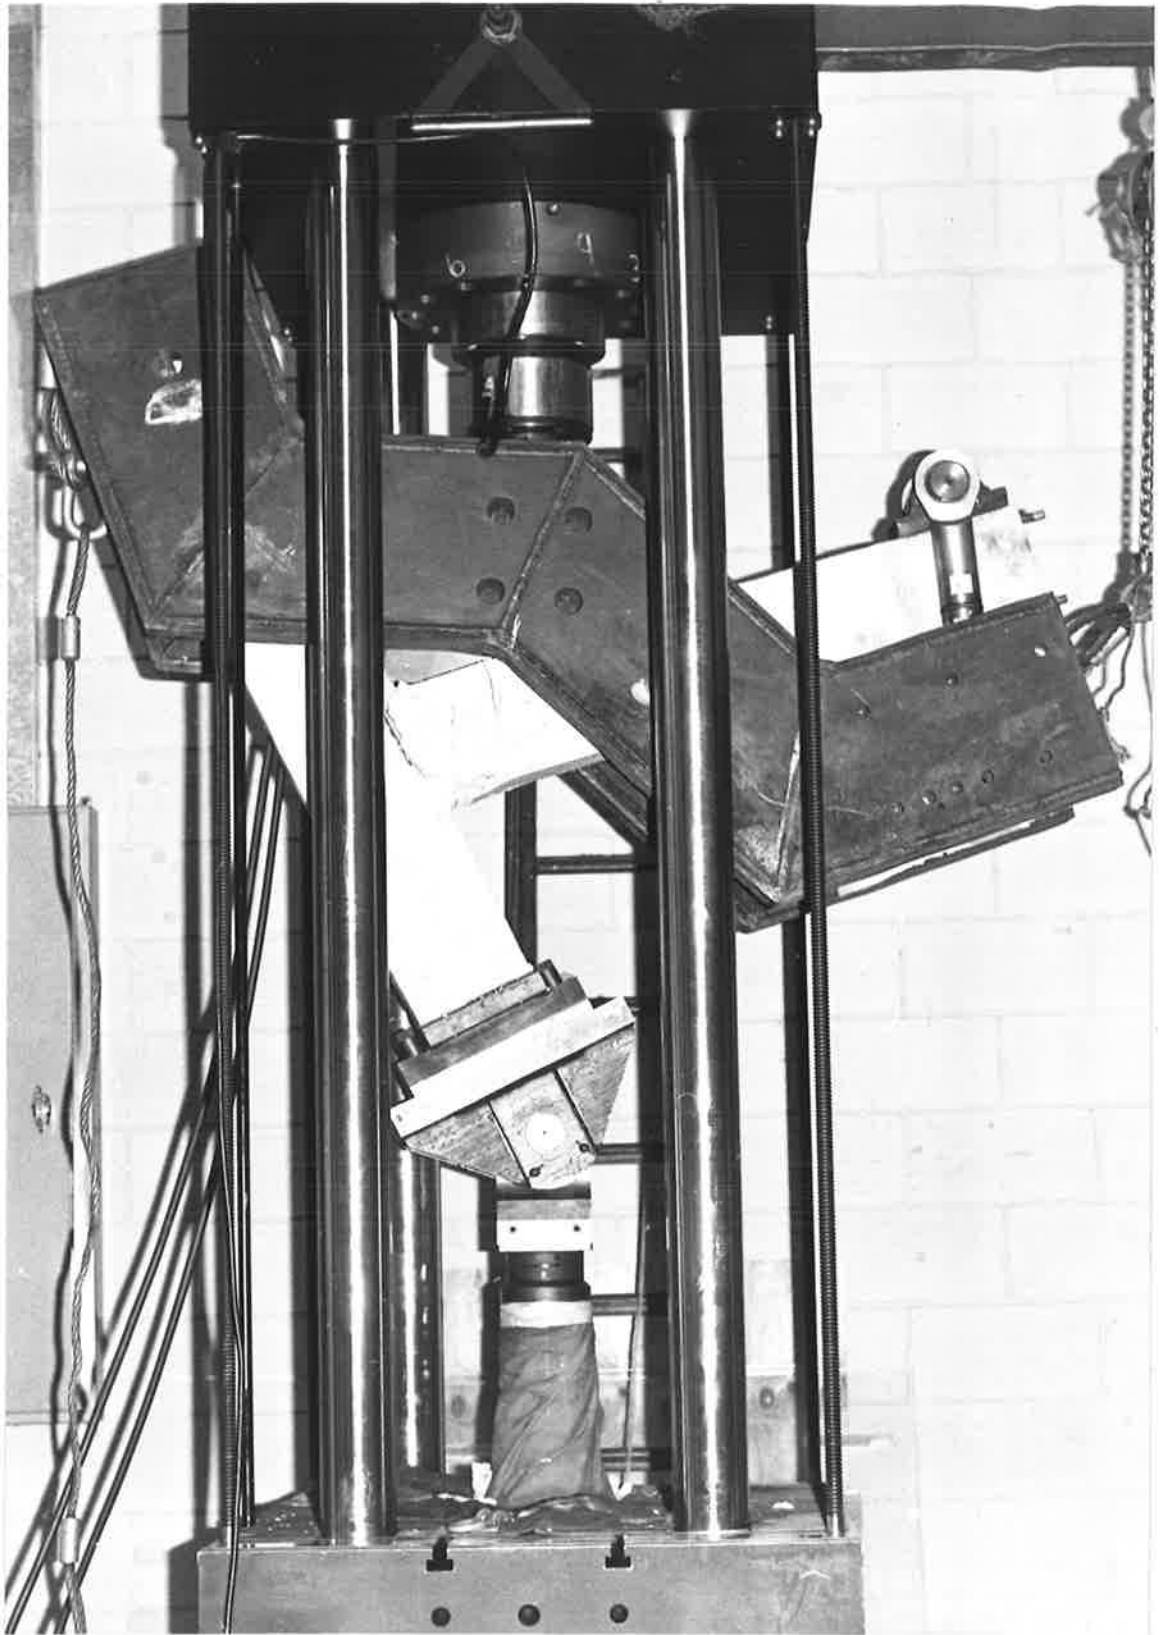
(a) Testing Rig and Specimen in Instron Testing Machine.
